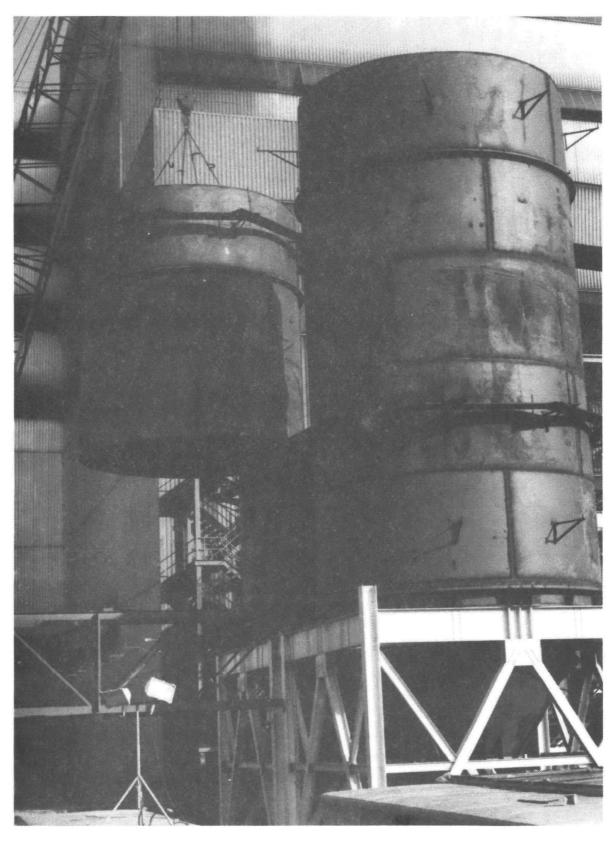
Construction photo showing installation of MgO silo at Eddystone. Boiler house appears in background.
